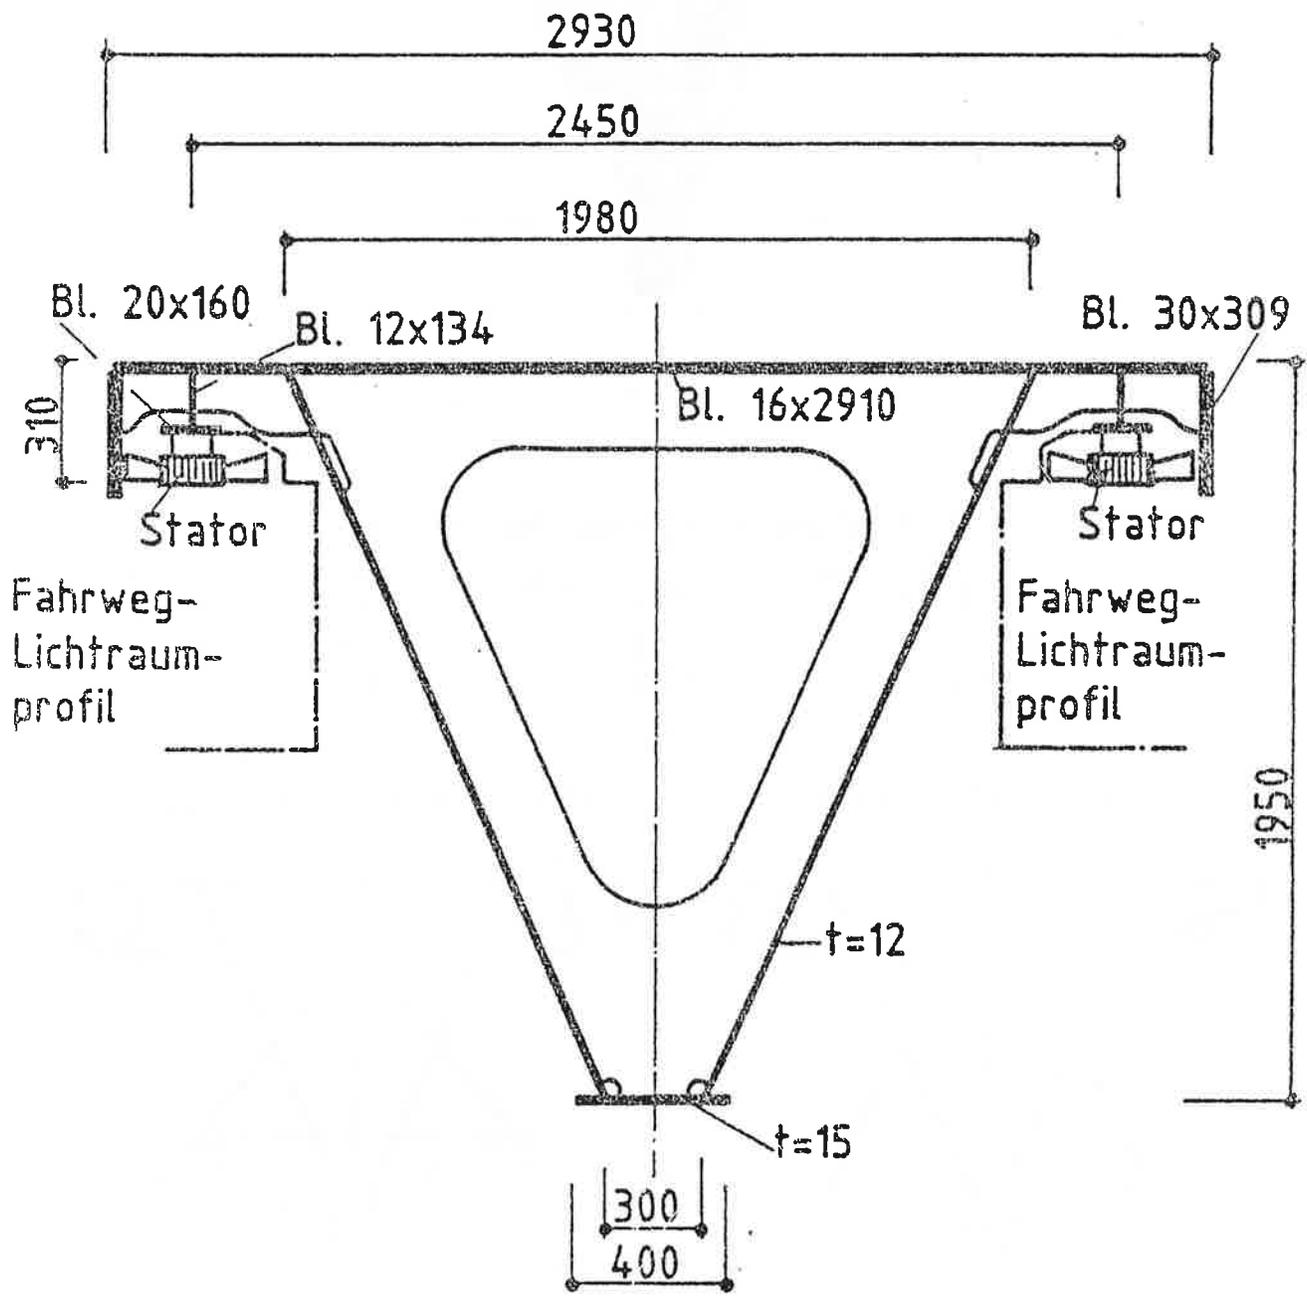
Cross-Section of Prototype Steel Beam (Florida)
